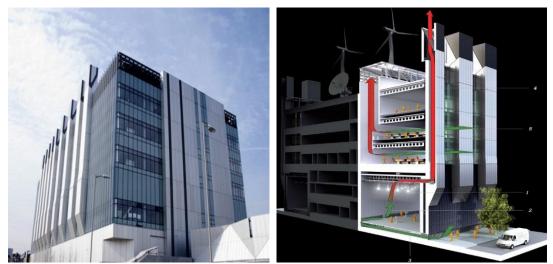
Harlequin 1 building, London, UK (Michler, A, 2010) and Natural Ventilation Method for Studios (Building, 2014)
